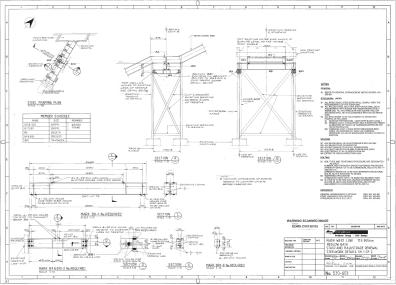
1994. Medlow Bath Stair and Balustrade Renewal Steelwork Details Sh1 of 2 Source: Sydney Trains.
